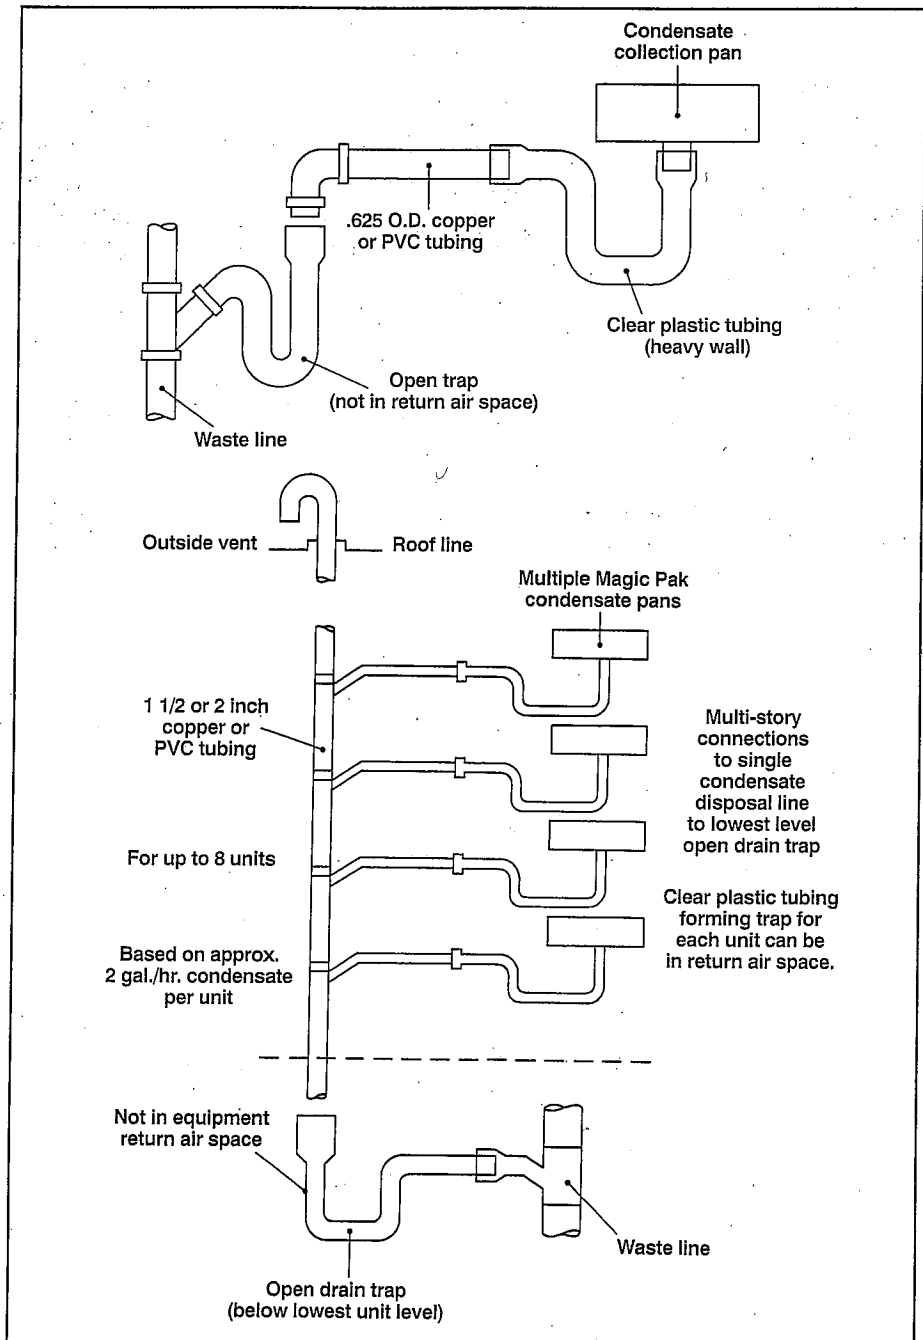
Line-drawing schematic of multistory condensate-removal system with trap at bottom floor of system (open trap), but closed in each floor enclosure used as return plenum. Also note — Individual open-trapped condensate lines for closed-ducted returns.
